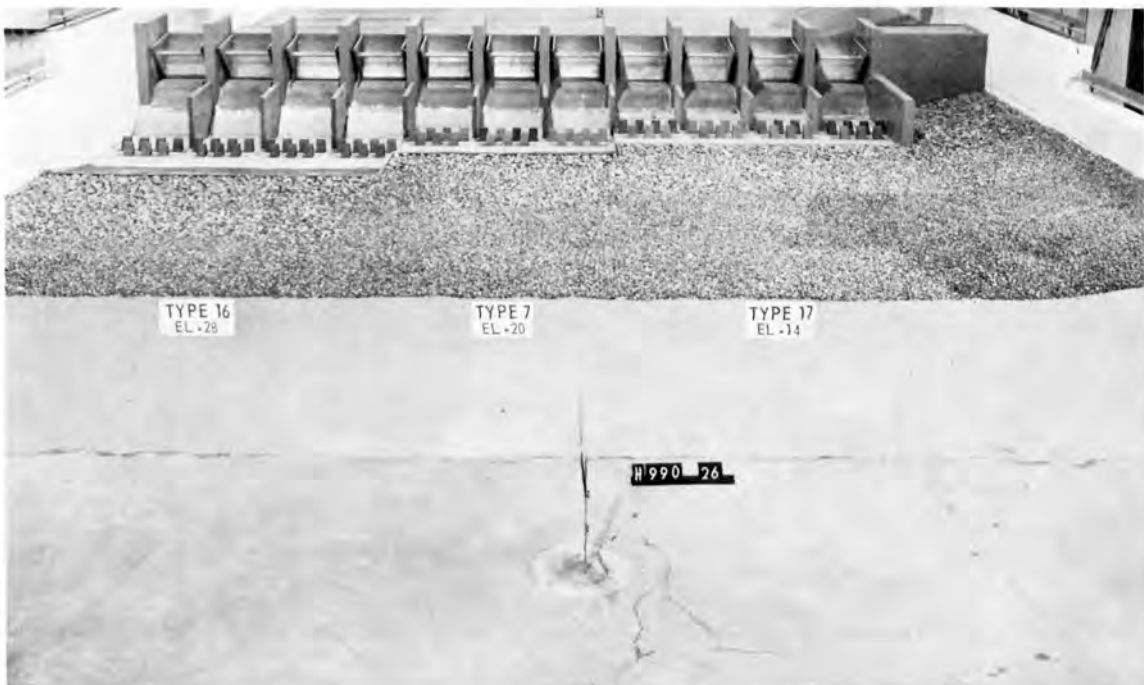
Dry bed of stilling basins; types 16, 7, and 17 (elevations of -28.0, -20.0, and -14.0, respectively)
